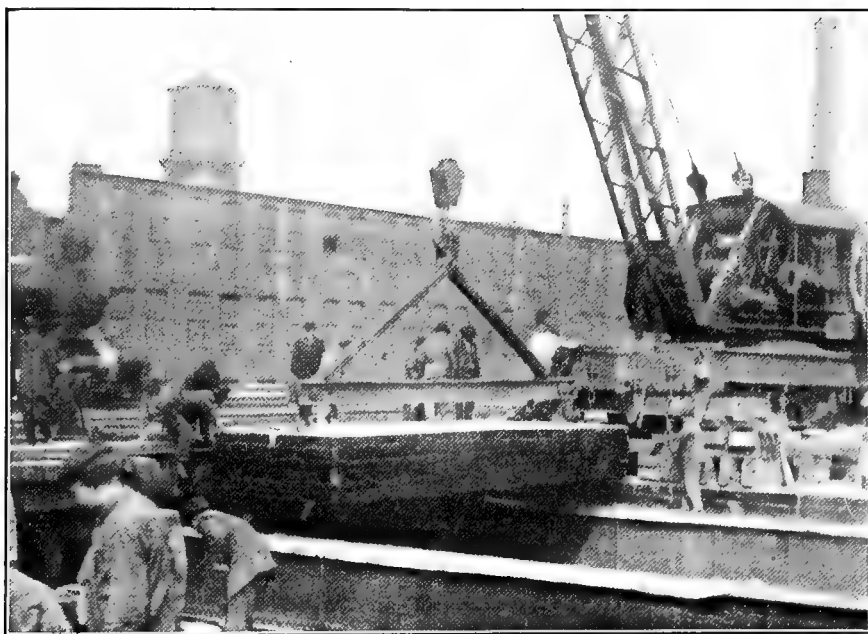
SETTING CONCRETE SLABS, C., B. & Q. R. R. TRACK ELEVATION.]
